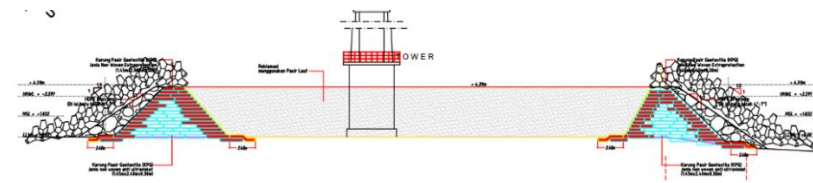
Cross-section of the compilation of planning protection structure with tetrapod armor.
